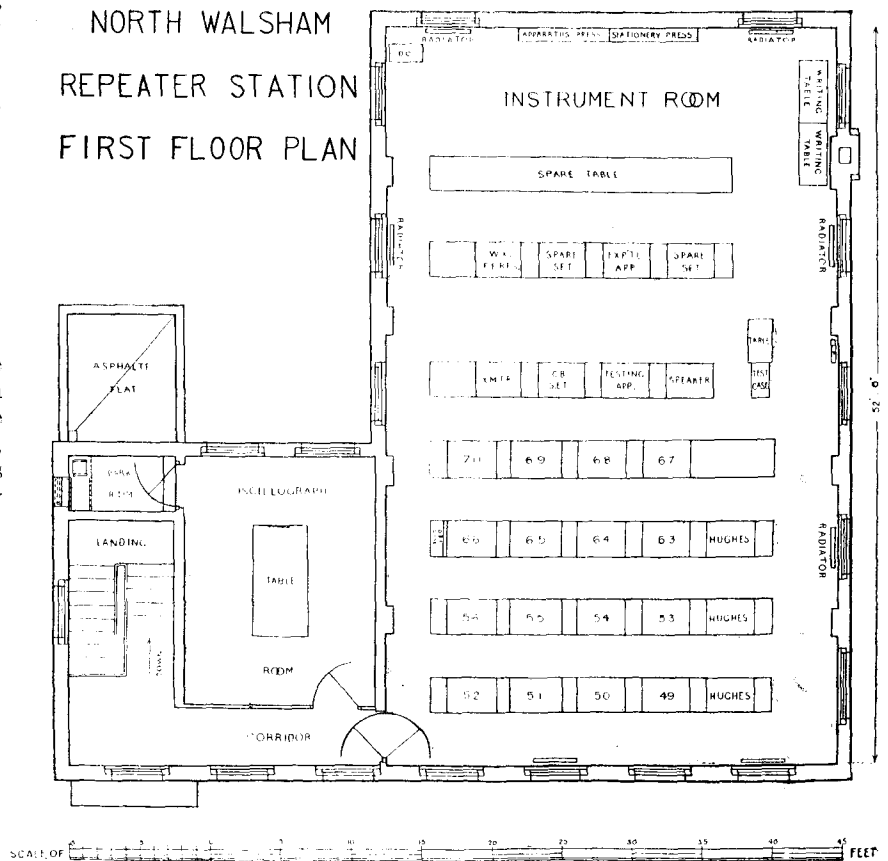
PLAN OF INSTRUMENT ROOM FLOOR.
